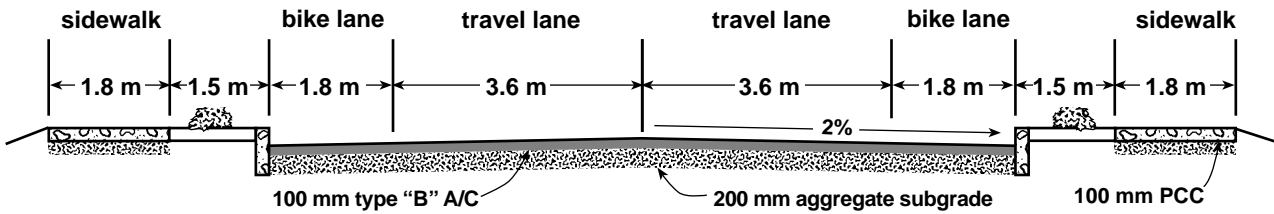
Typical urban roadway cross-section with bike lanes and sidewalks
